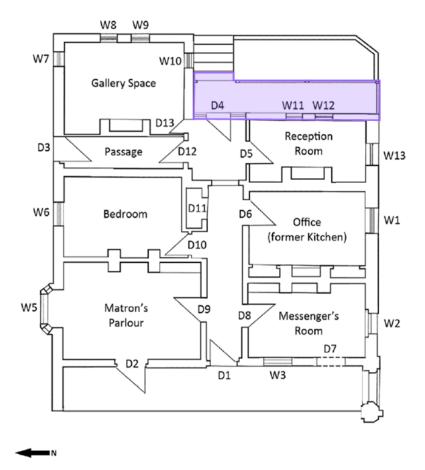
Plan of the Matron's Quarters building. The main subject area of the Degraves Lane verandah and façade is highlighted in purple. Not to Scale.
